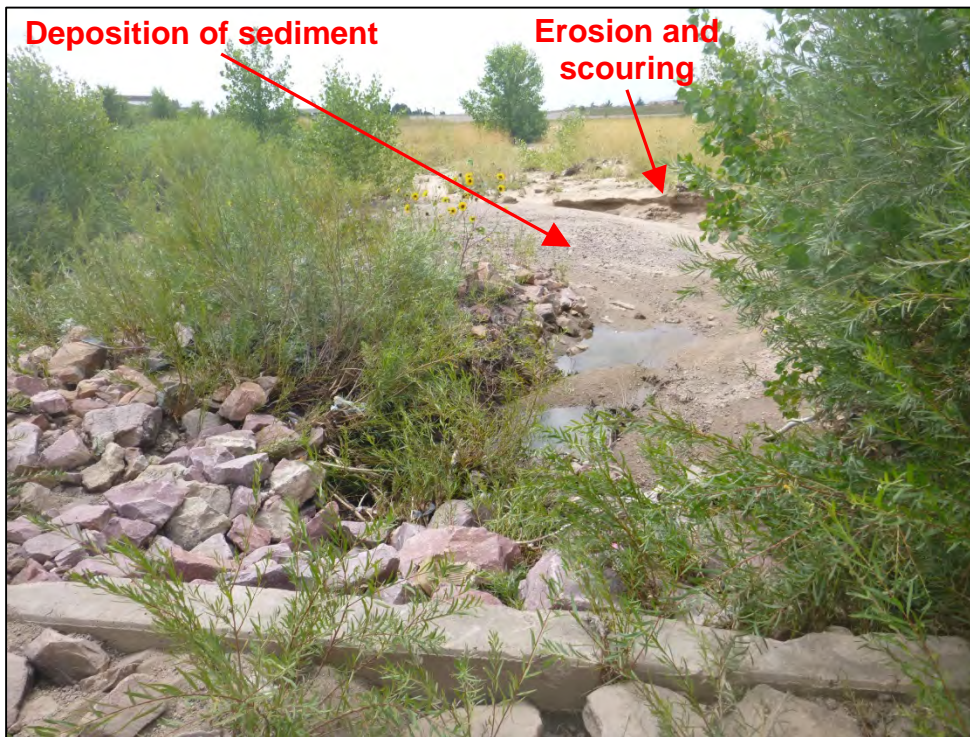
View, facing upstream, of Tutt Boulevard channel outfall to the Sand Creek Detention Basin No. 1, shown in Photograph 111.
